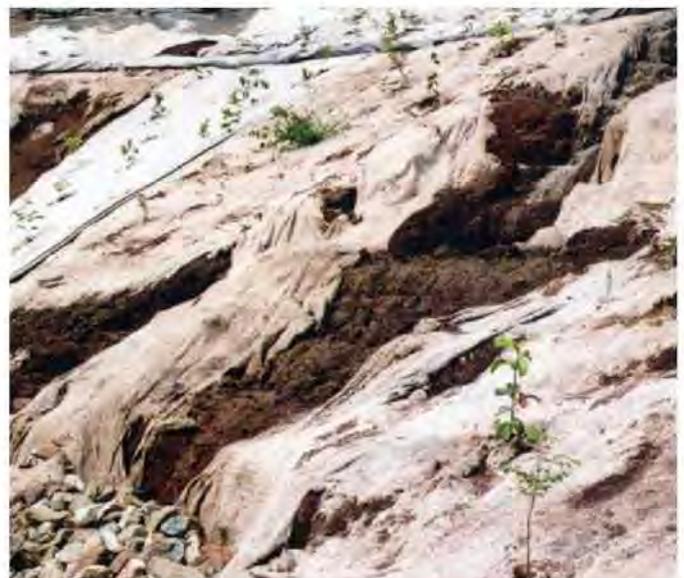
ECB failure due to poor surface preparation and water ingress through tree planting cuts. (Source: Landloch Pty Ltd)
